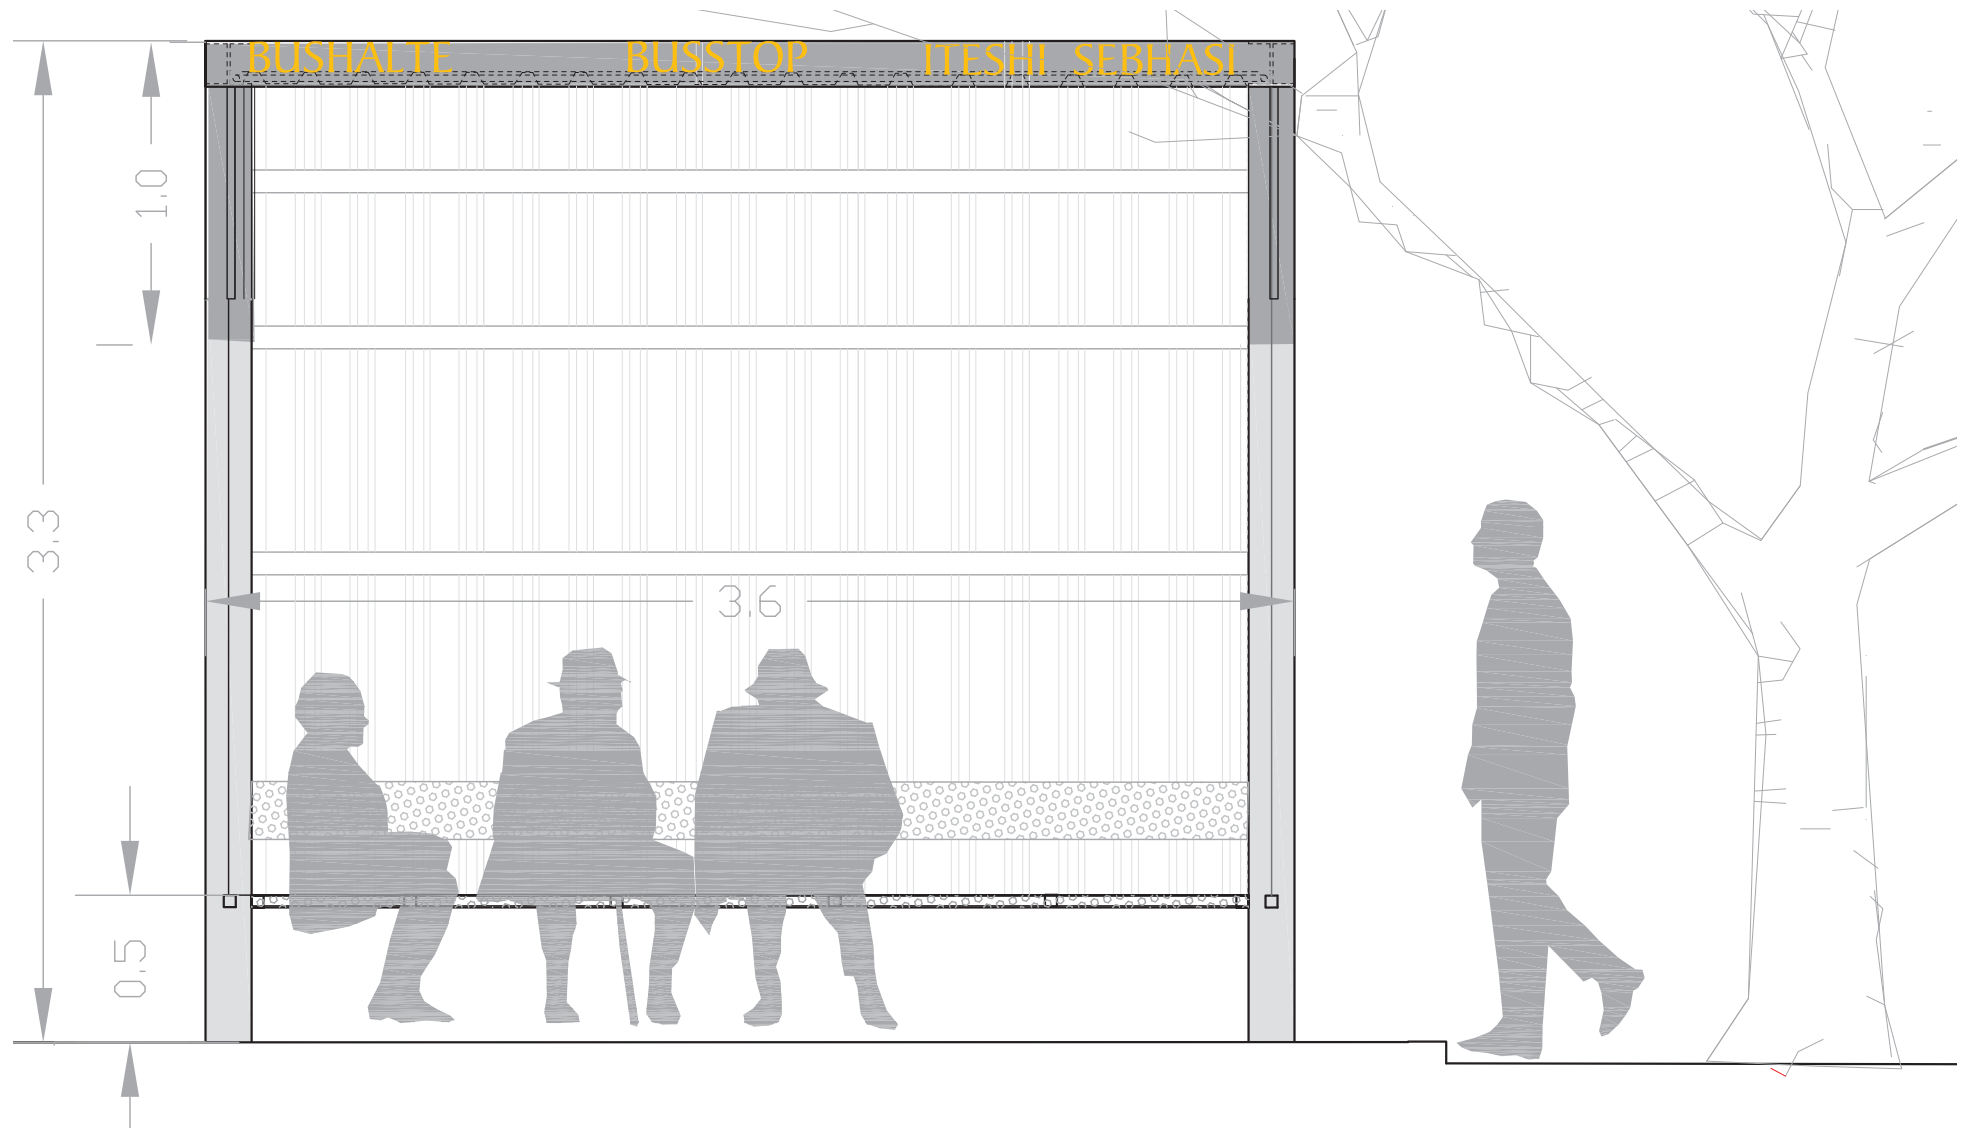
Shelter. Elevation. Scale 1:25 (Author, 2008)
